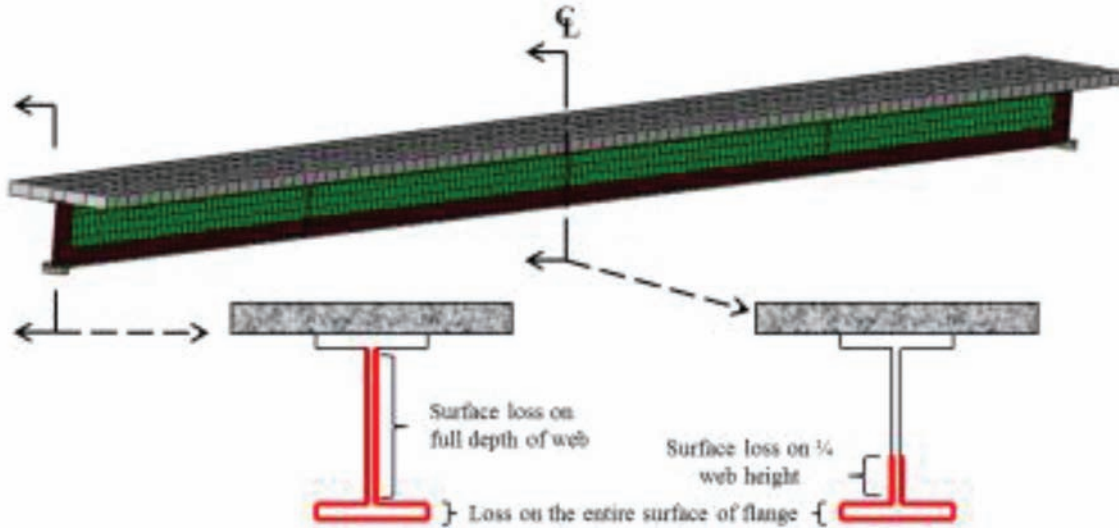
Assumed damage profile due to corrosion in steel girders.
